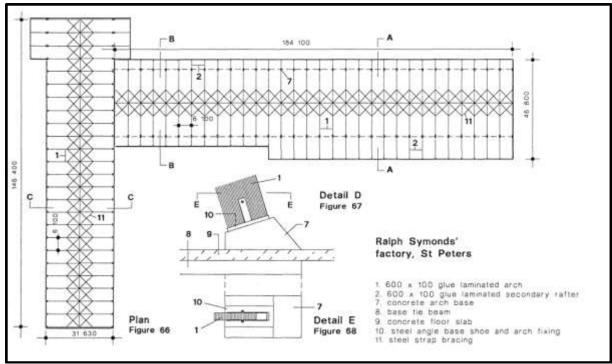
Plan of building 1994. Shows full extent of Holland Street arm (horizontal), which has since been shortened. (Source: Nolan, 1994).
